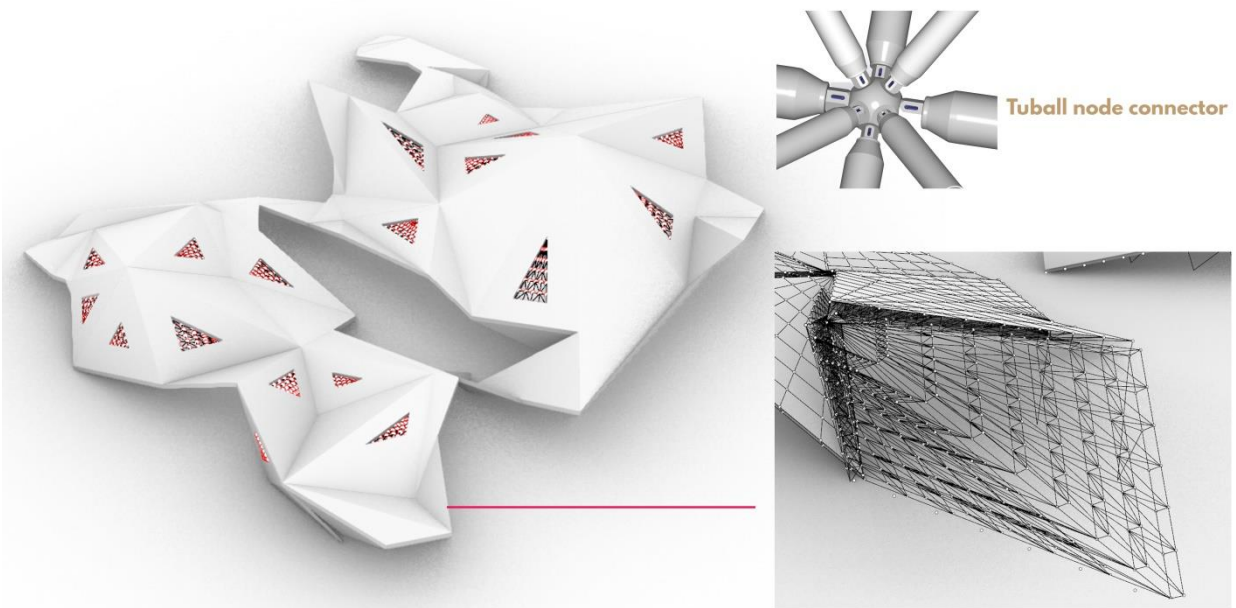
Outer shell structure, space frame detail and joinery (Author ,2020)
